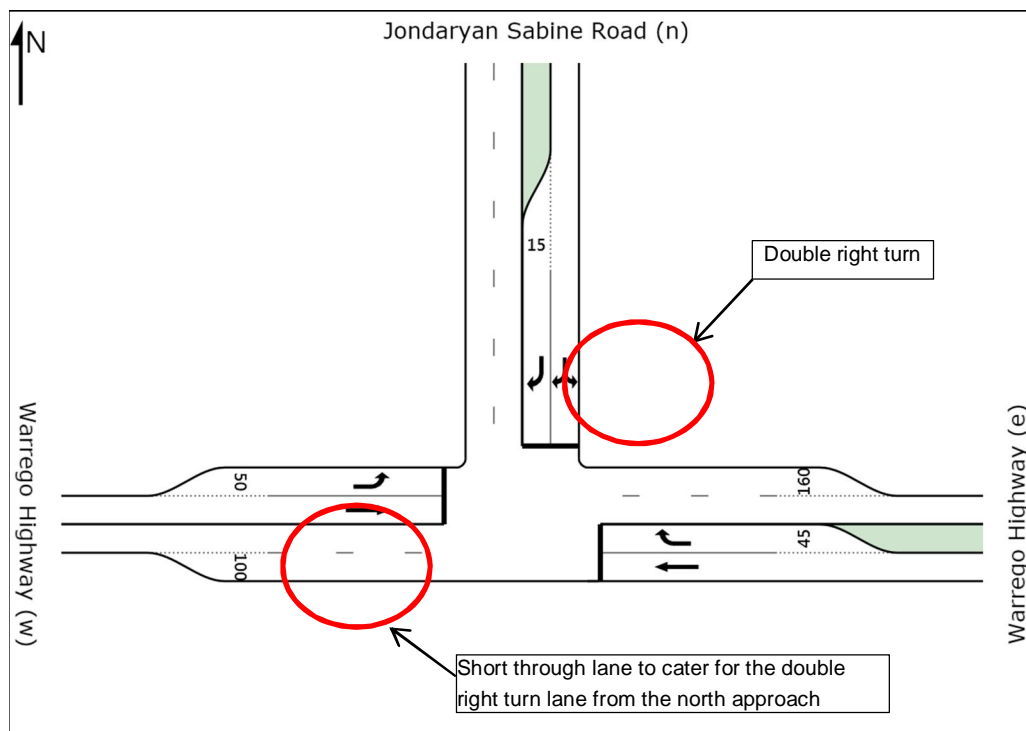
Revised intersection layout – Warrego Highway/Jondaryan Sabine Road
